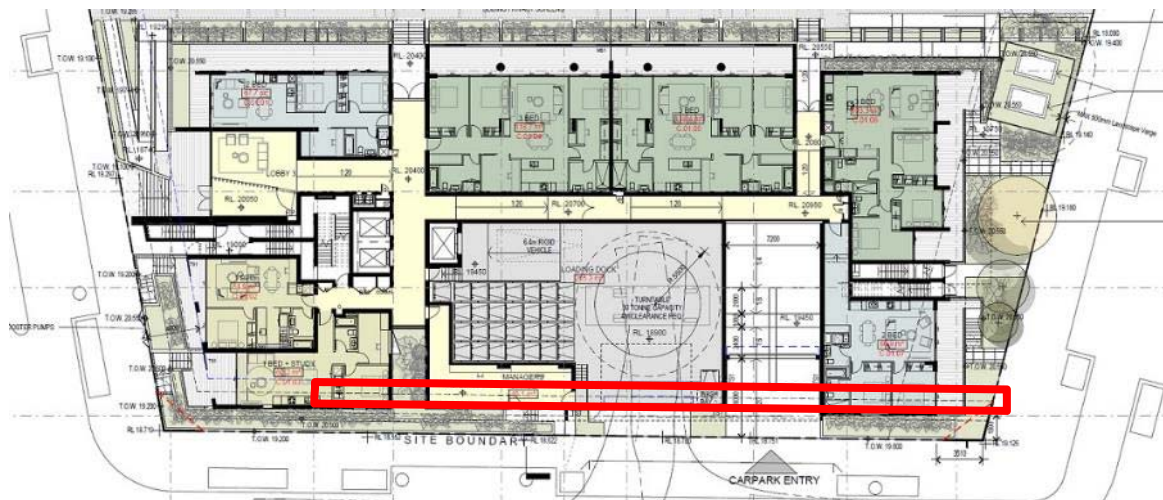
Extract of floor plan showing Sonny Leonard Street ground floor and first floor setback non-compliance
